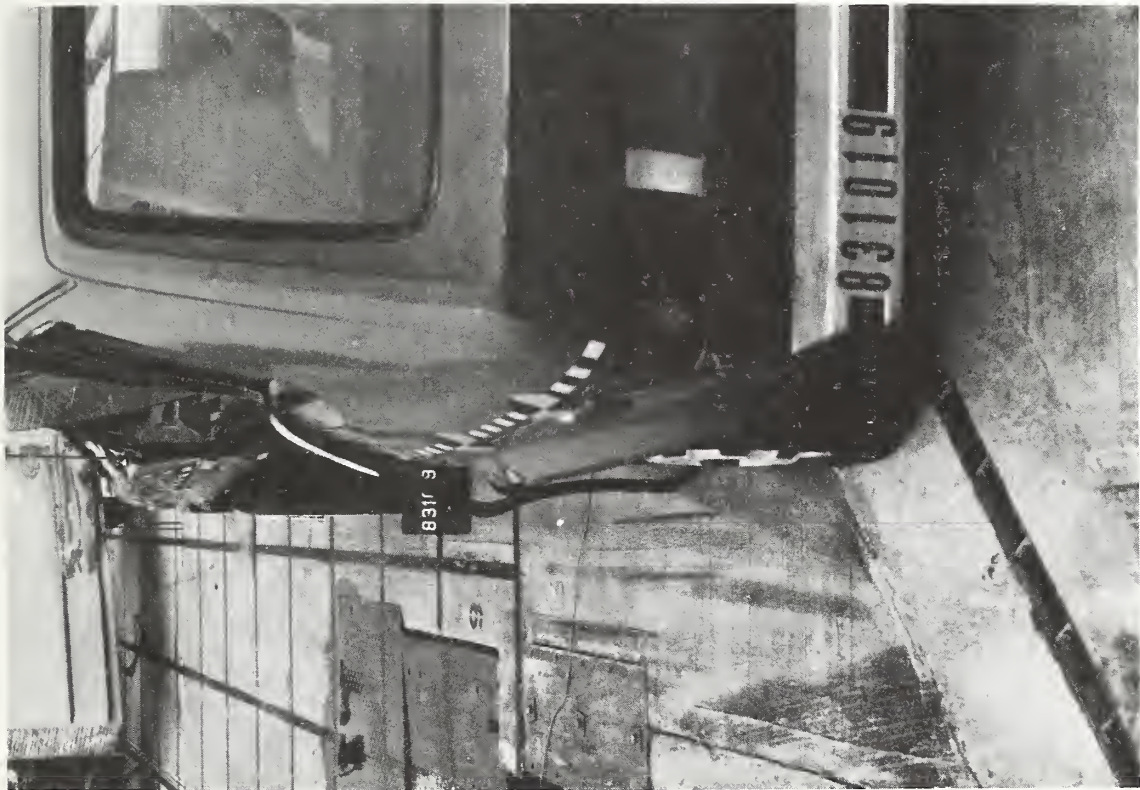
POST-TEST CLOSEUP - VIEW 1
